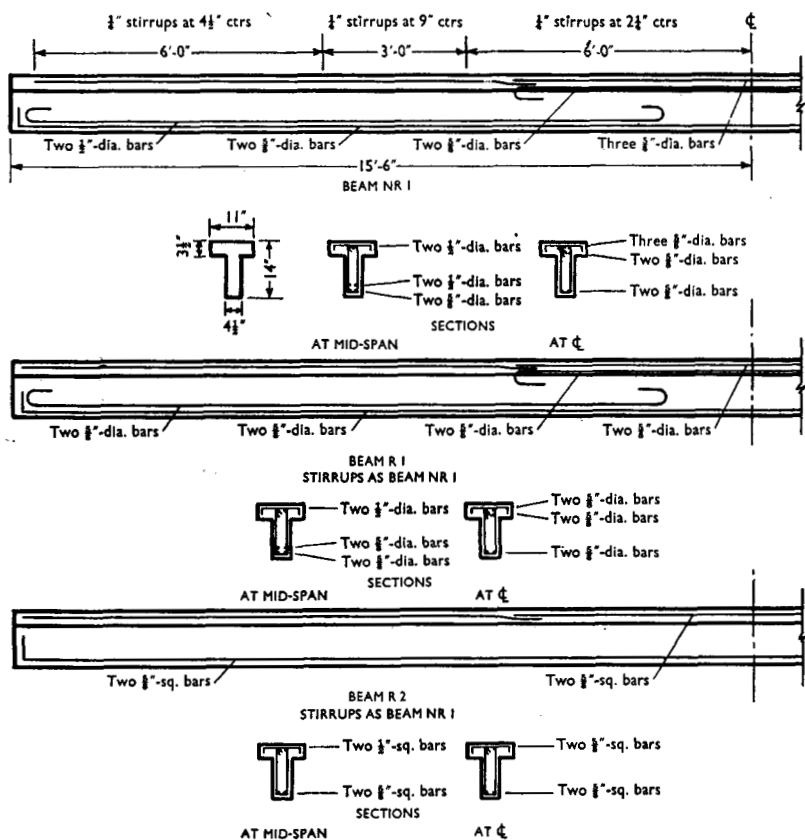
DETAILS OF BEAMS, SERIES 2
